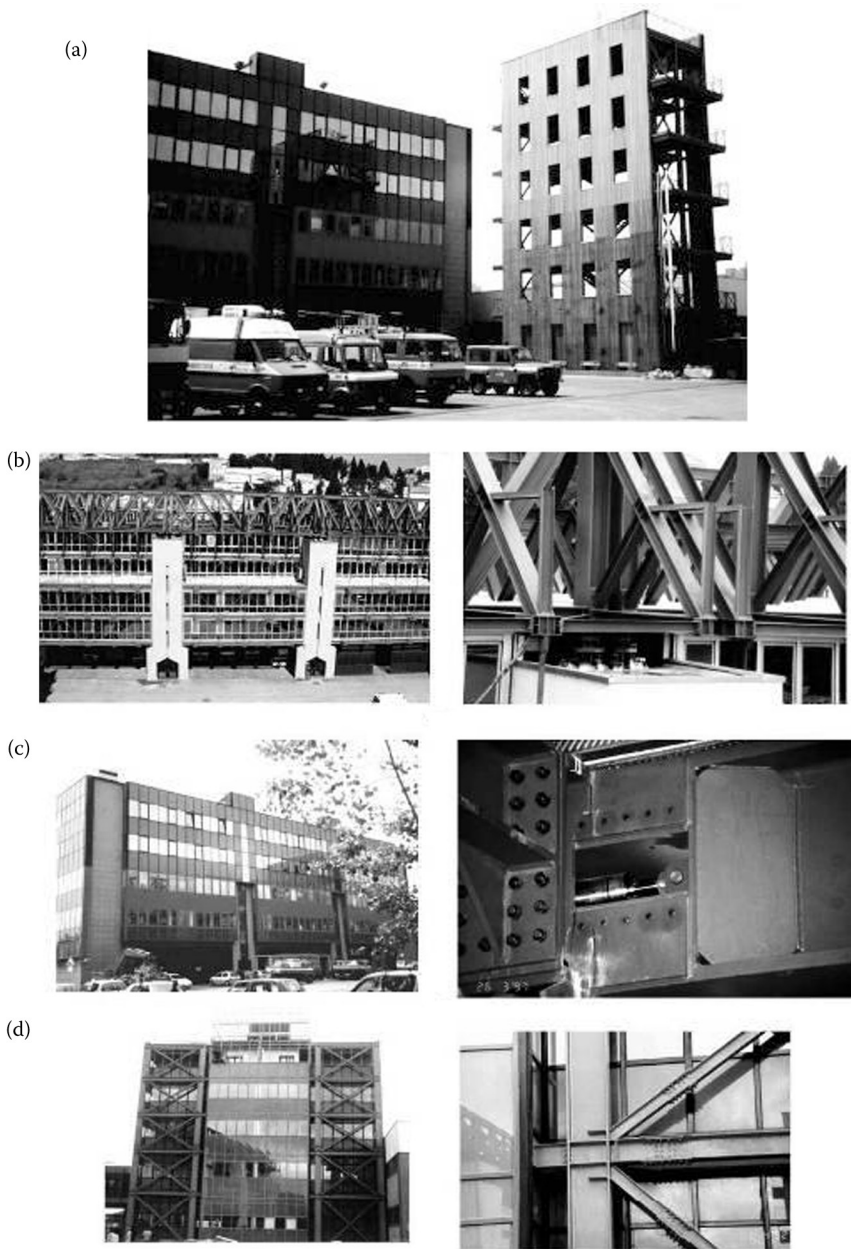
Fire brigade center of Naples: (a) general view; (b) Building A; (c) Building B; (d) Building E.
